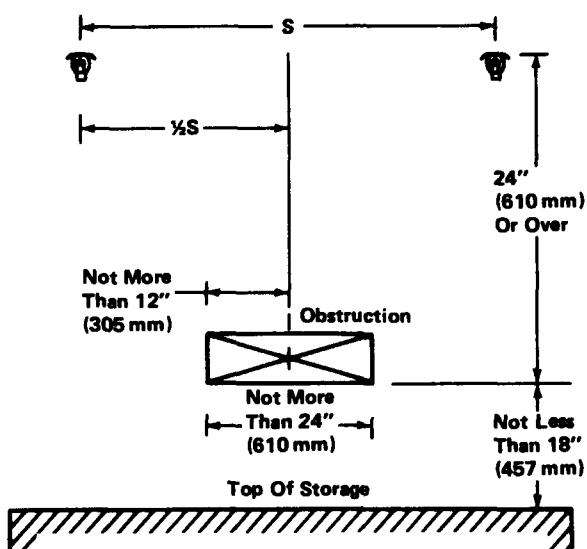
Position of sprinklers in relation to obstructions located 24 in. (610 mm) or more below deflectors.
